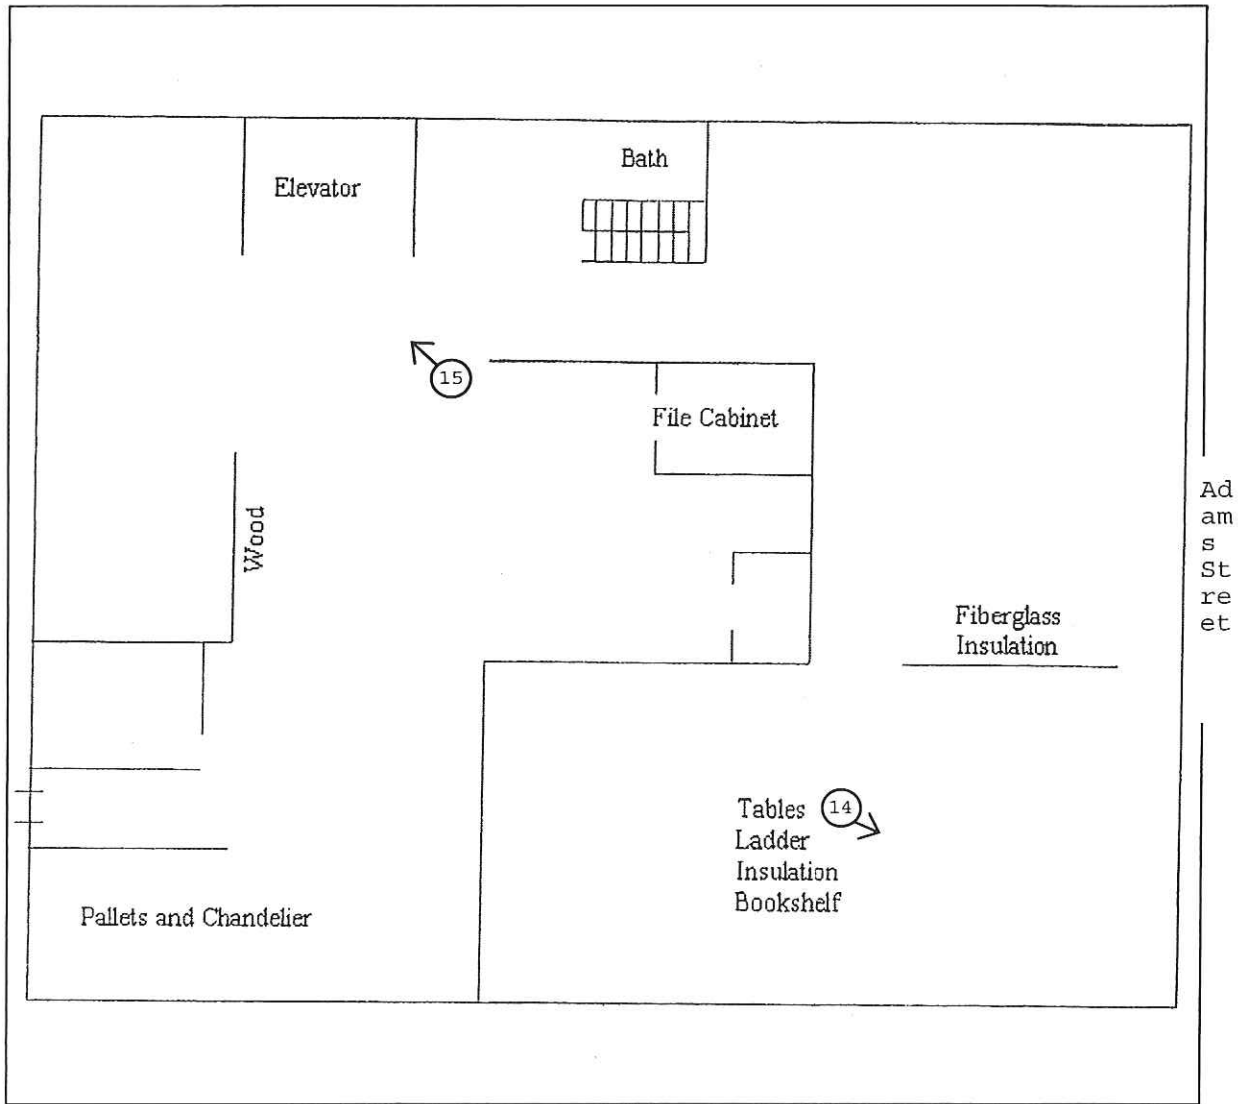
Third Floor Schematic Plan for 1301 Adams Street, showing locations of photographs 14-15.
